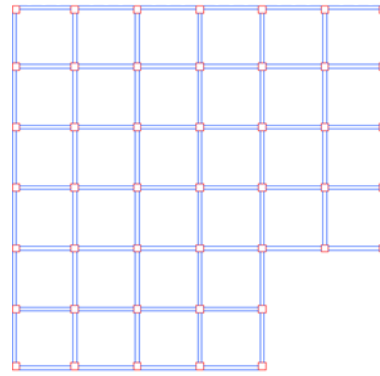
Flexible joint application between vertical carrier systems and the wall [10]
